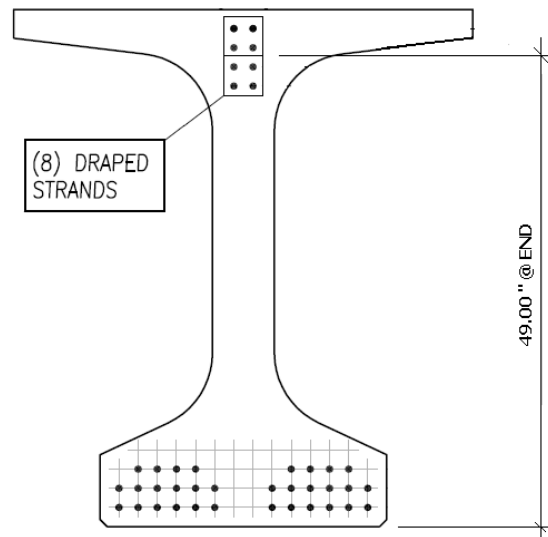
Cross section showing the strand pattern at the end of the girder.
